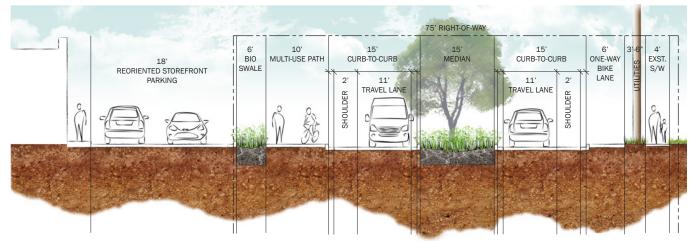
B: Proposed Enhancements along 5th Street with the Addition of a Neutral Ground, a Multi-Use Path, Stormwater Management Facilities, Street Trees, and Reconfigured Parking
